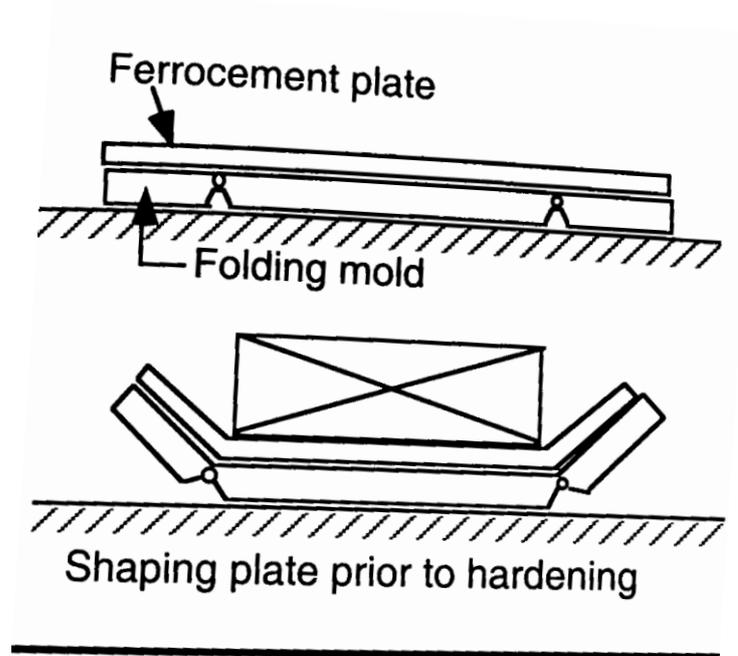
3: Moulding of flat plate to U shaped section (NAMAAN 2000)
